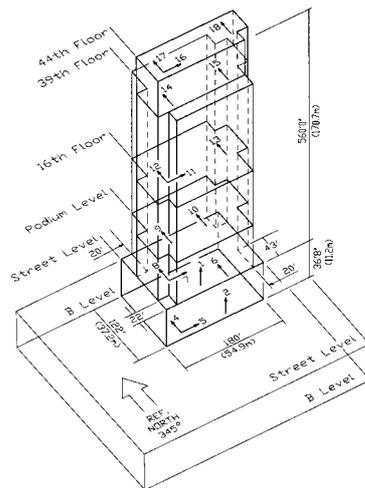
Three-dimensional schematic of Embarcadero Building [EMB] and its instrumentation scheme.
